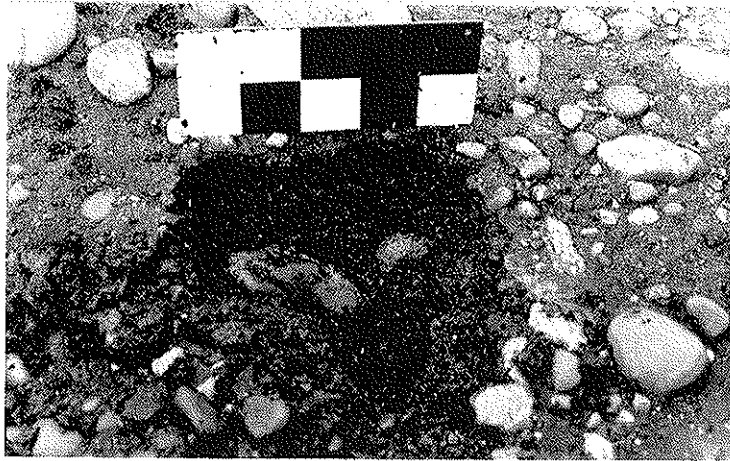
Close Up Through Asphalt Pavement on Espora Beach
